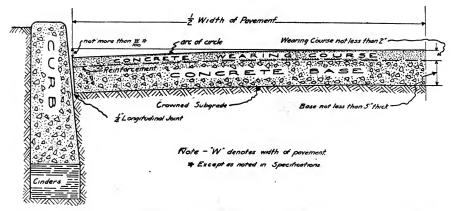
TWO-COURSE CONCRETE PAVEMENT FOR PAVEMENT OVER 20 FEET WIDE.
